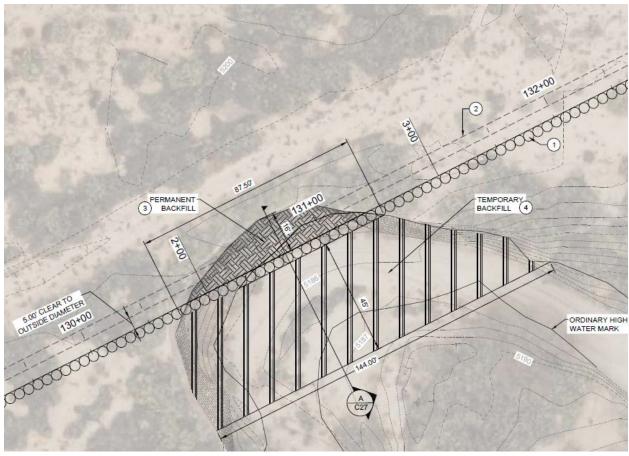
Concrete pile tangent wall design exhibit indicating the permanent and temporary backfill locations.
